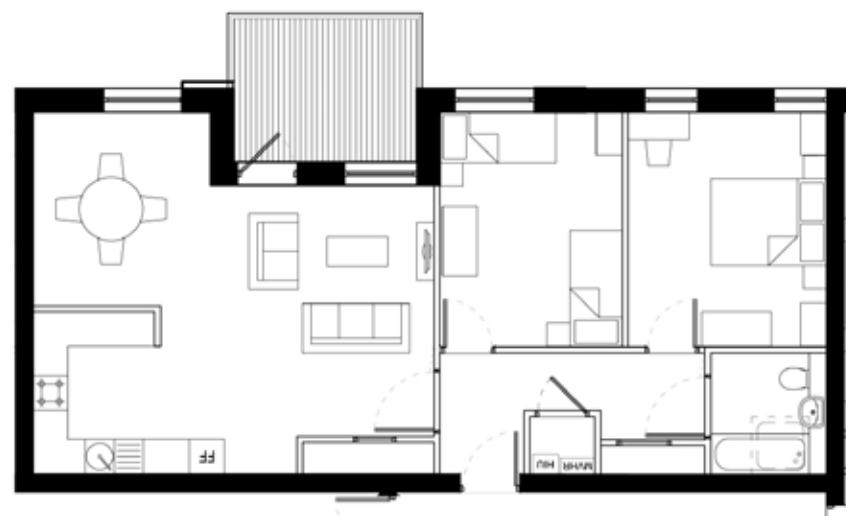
PERIMETER BLOCK FLAT PLANS
